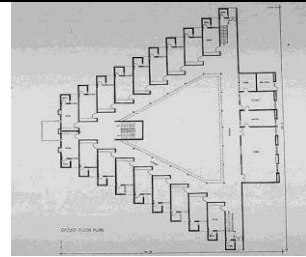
The Triangular plan of the prayer hall. (Source: Archnet.org)
